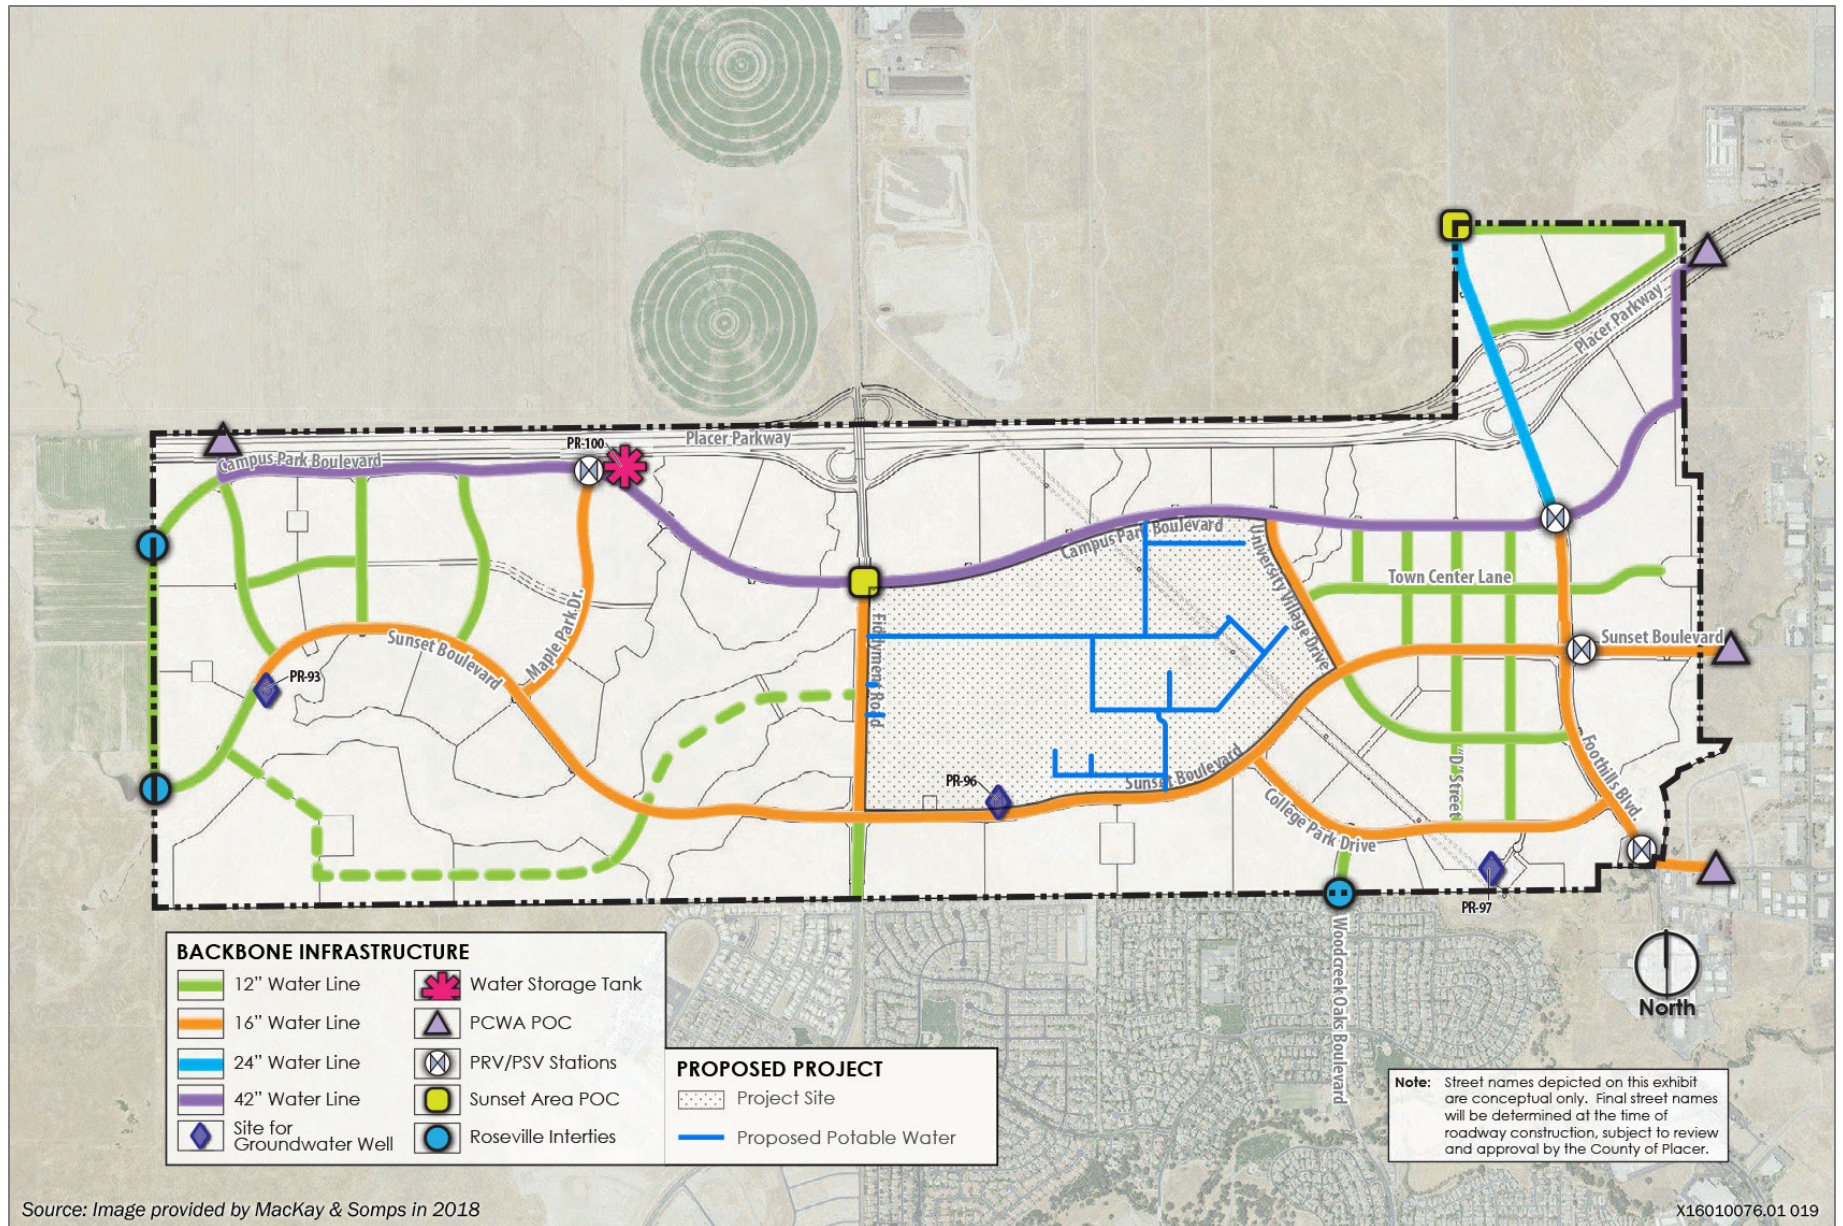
Placer Ranch Specific Plan and Sacramento State – Placer Center Water Infrastructure
